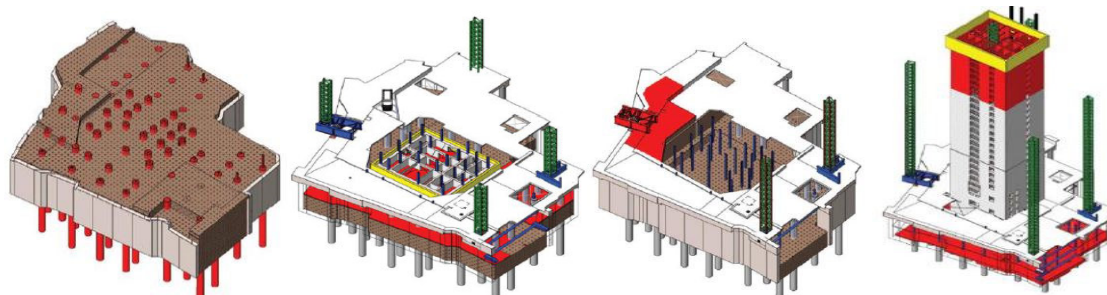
(a-b) Southwark Tower basement views, (c) concrete pouring process (URL-9)
